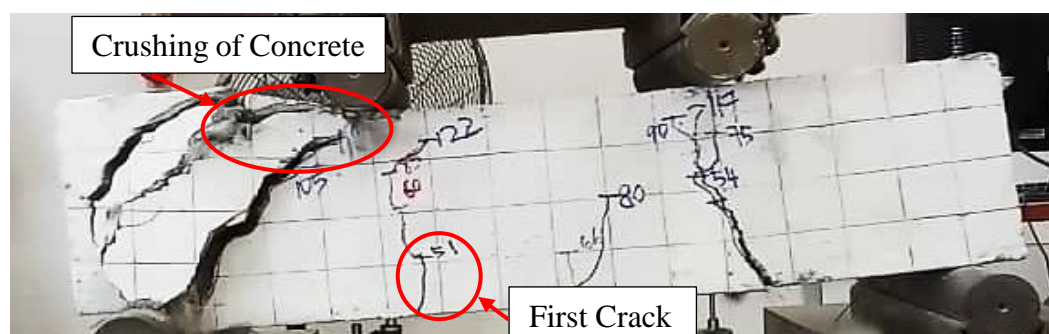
First Crack and Crushing of NWRC-W/S Beam
